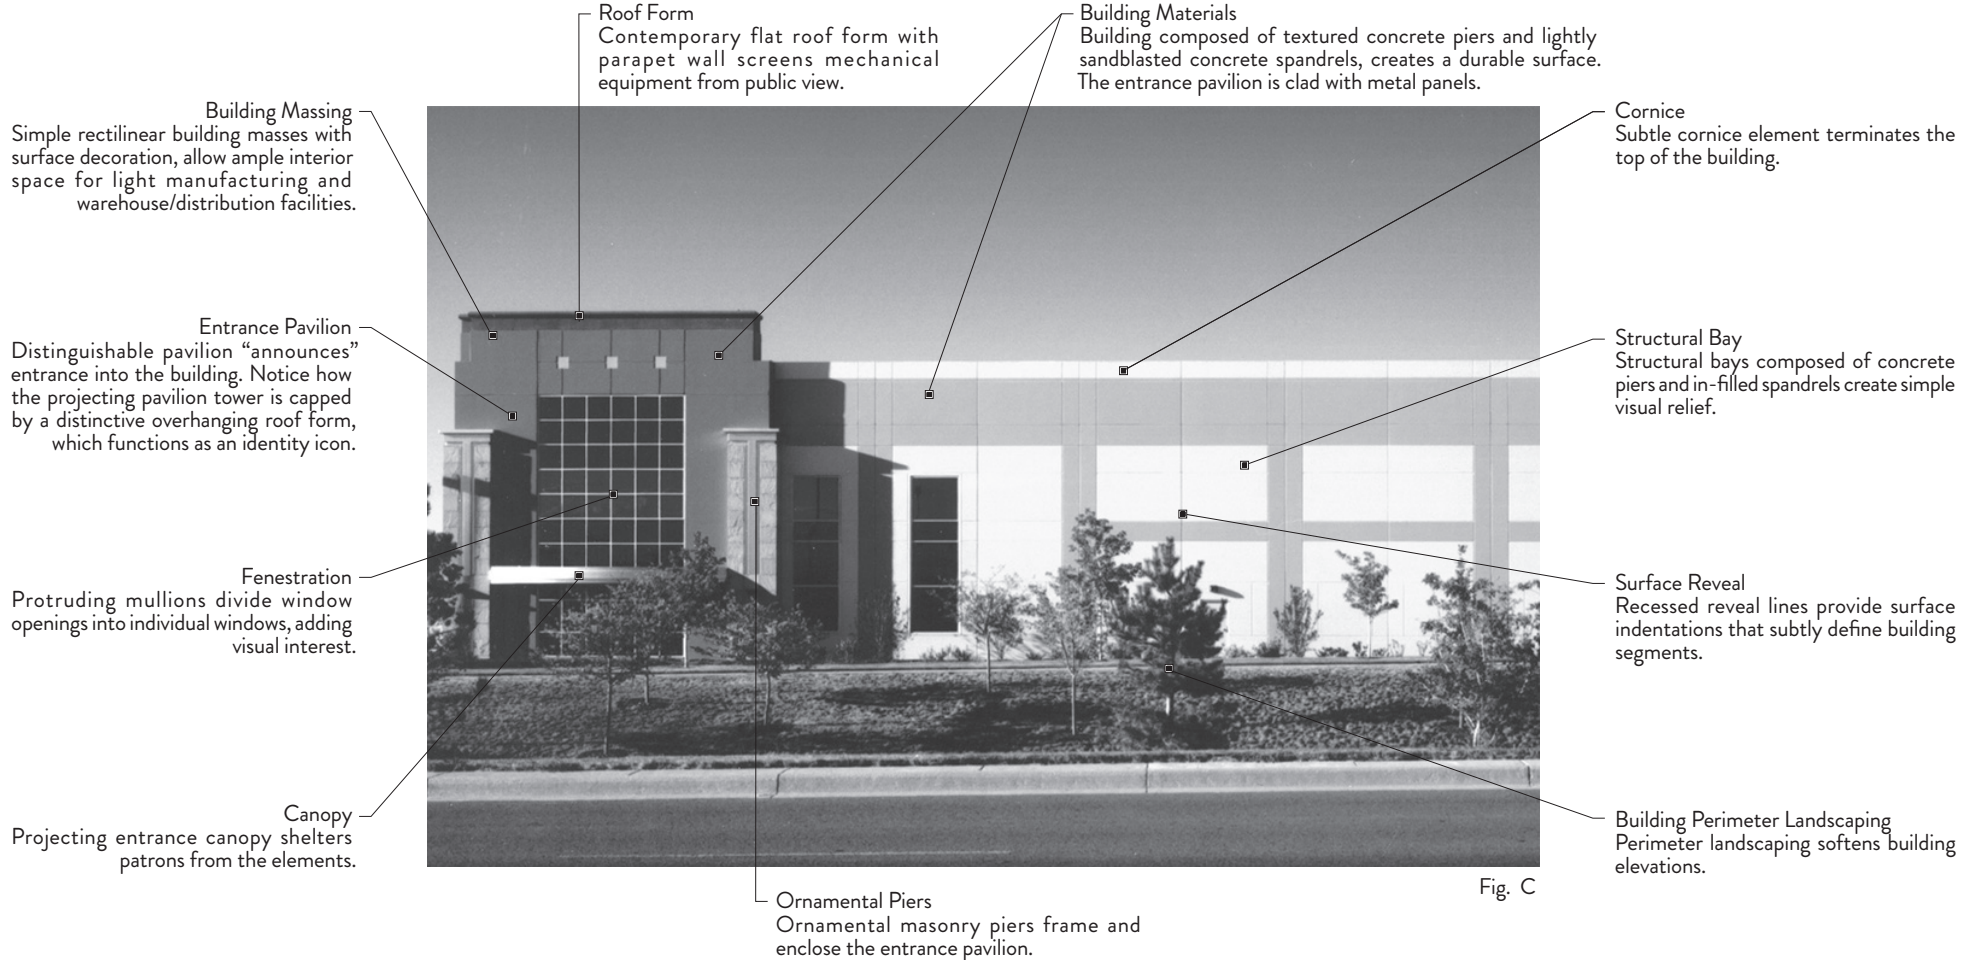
Segment building facades into a series of individual structural bays composed of piers, spandrels, and window openings.
